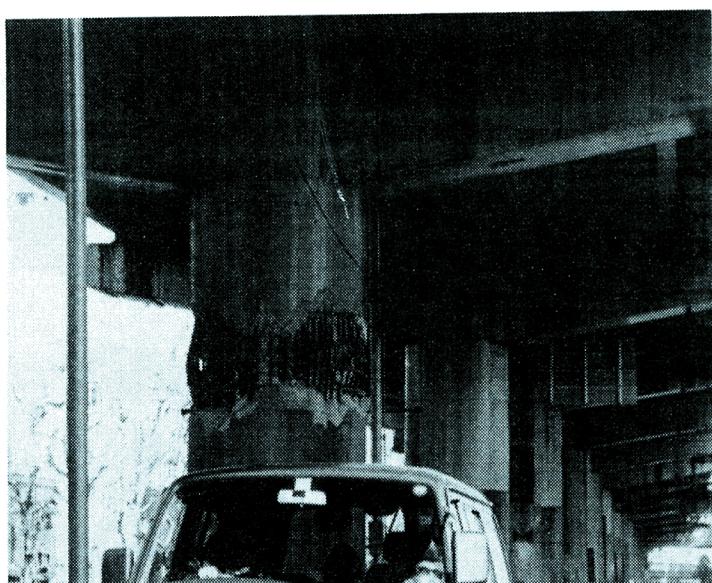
Bending-shear failure of a single column type highway viaduct pier
